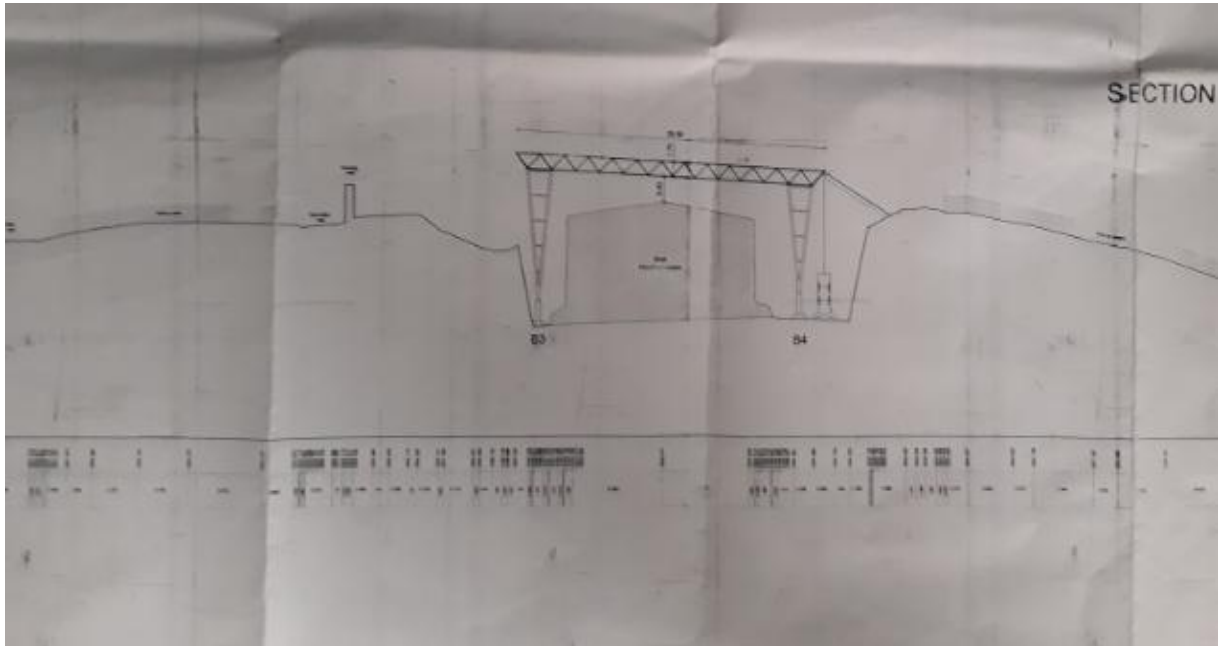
section drawing for shelter-A (source from ARCCH, working drawing)
